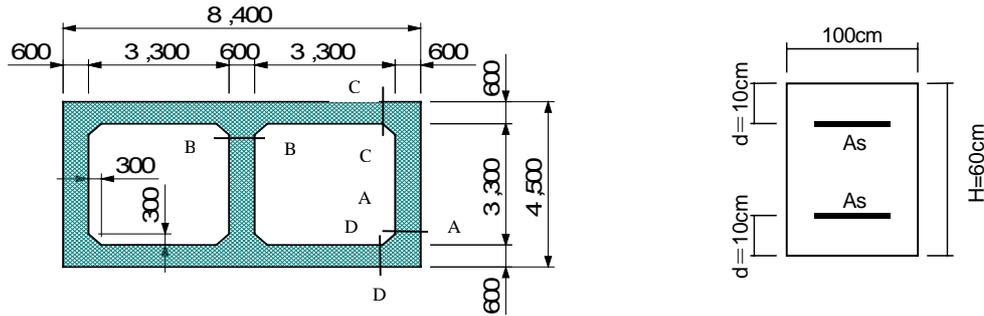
Cross section and main reinforcement arrangement of the duct to be assessed.
